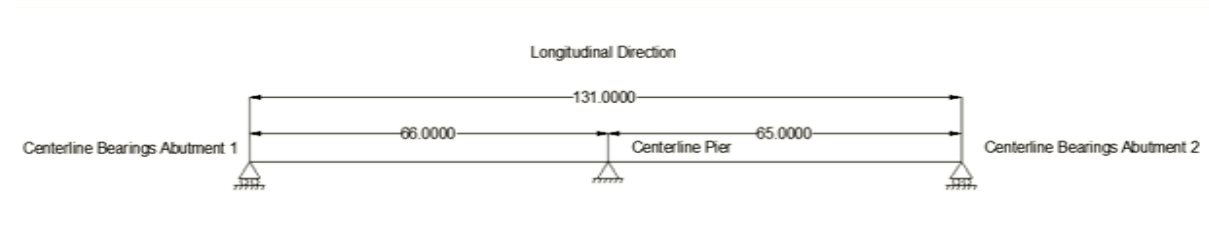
Longitudinal cross section of proposed Belmont Street/Route 9 Bridge re-design
